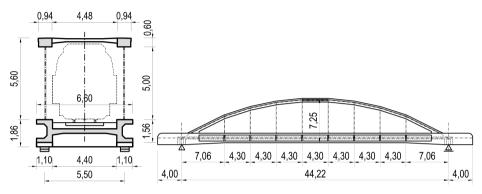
Railway bridge over the river Orz in Gucin, Poland: left - cross-section, right - side view.
